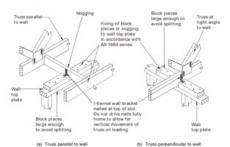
FIXING OF TRUSSES TO FREESTANDING NON-LOADBEARING WALL THAT IS A BRACING WALL
